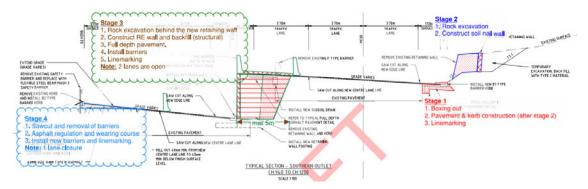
Typical section – Southern Outlet Ch. 940 to Ch. 1200
